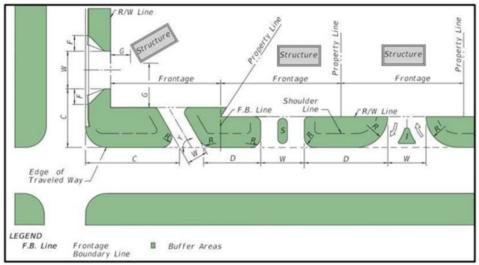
Driveway Geometry, adapted from FDOT Multimodal Access Management Guidebook (FDOT 2023)
